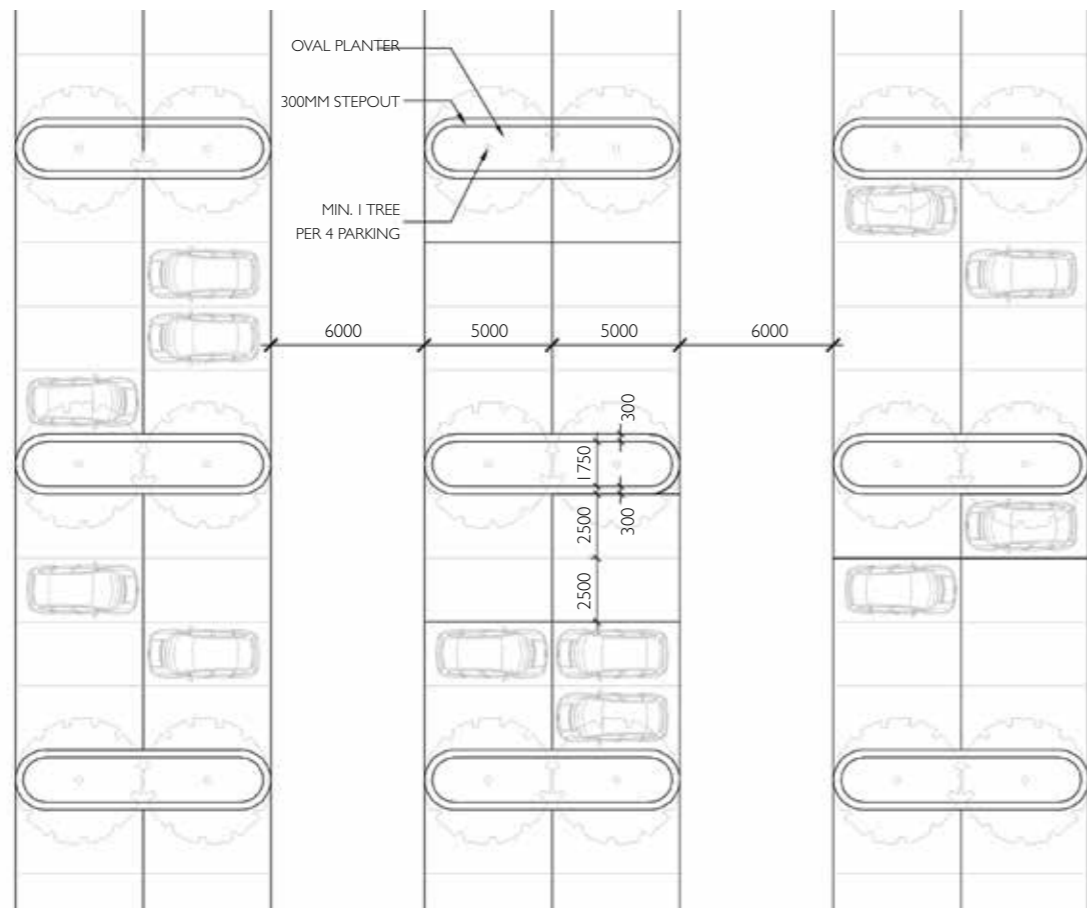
Shade Tree Layout in Parking Lots (alternate)
